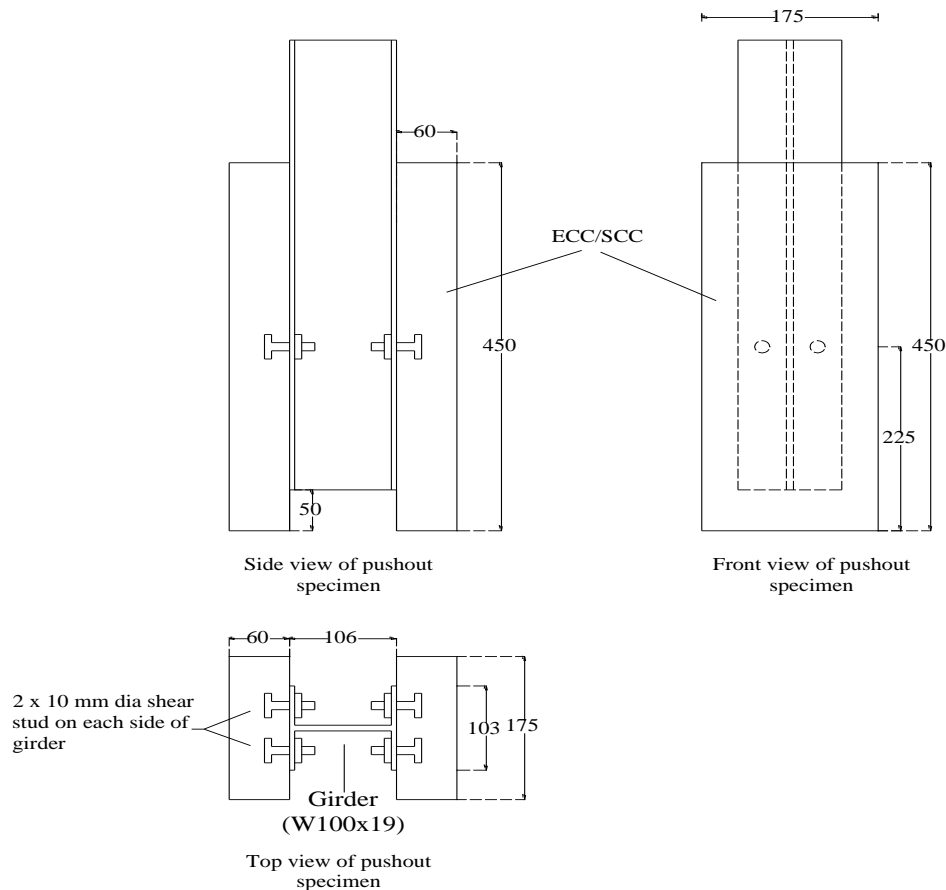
Geometry of pushout specimen (All dimensions are in mm)
